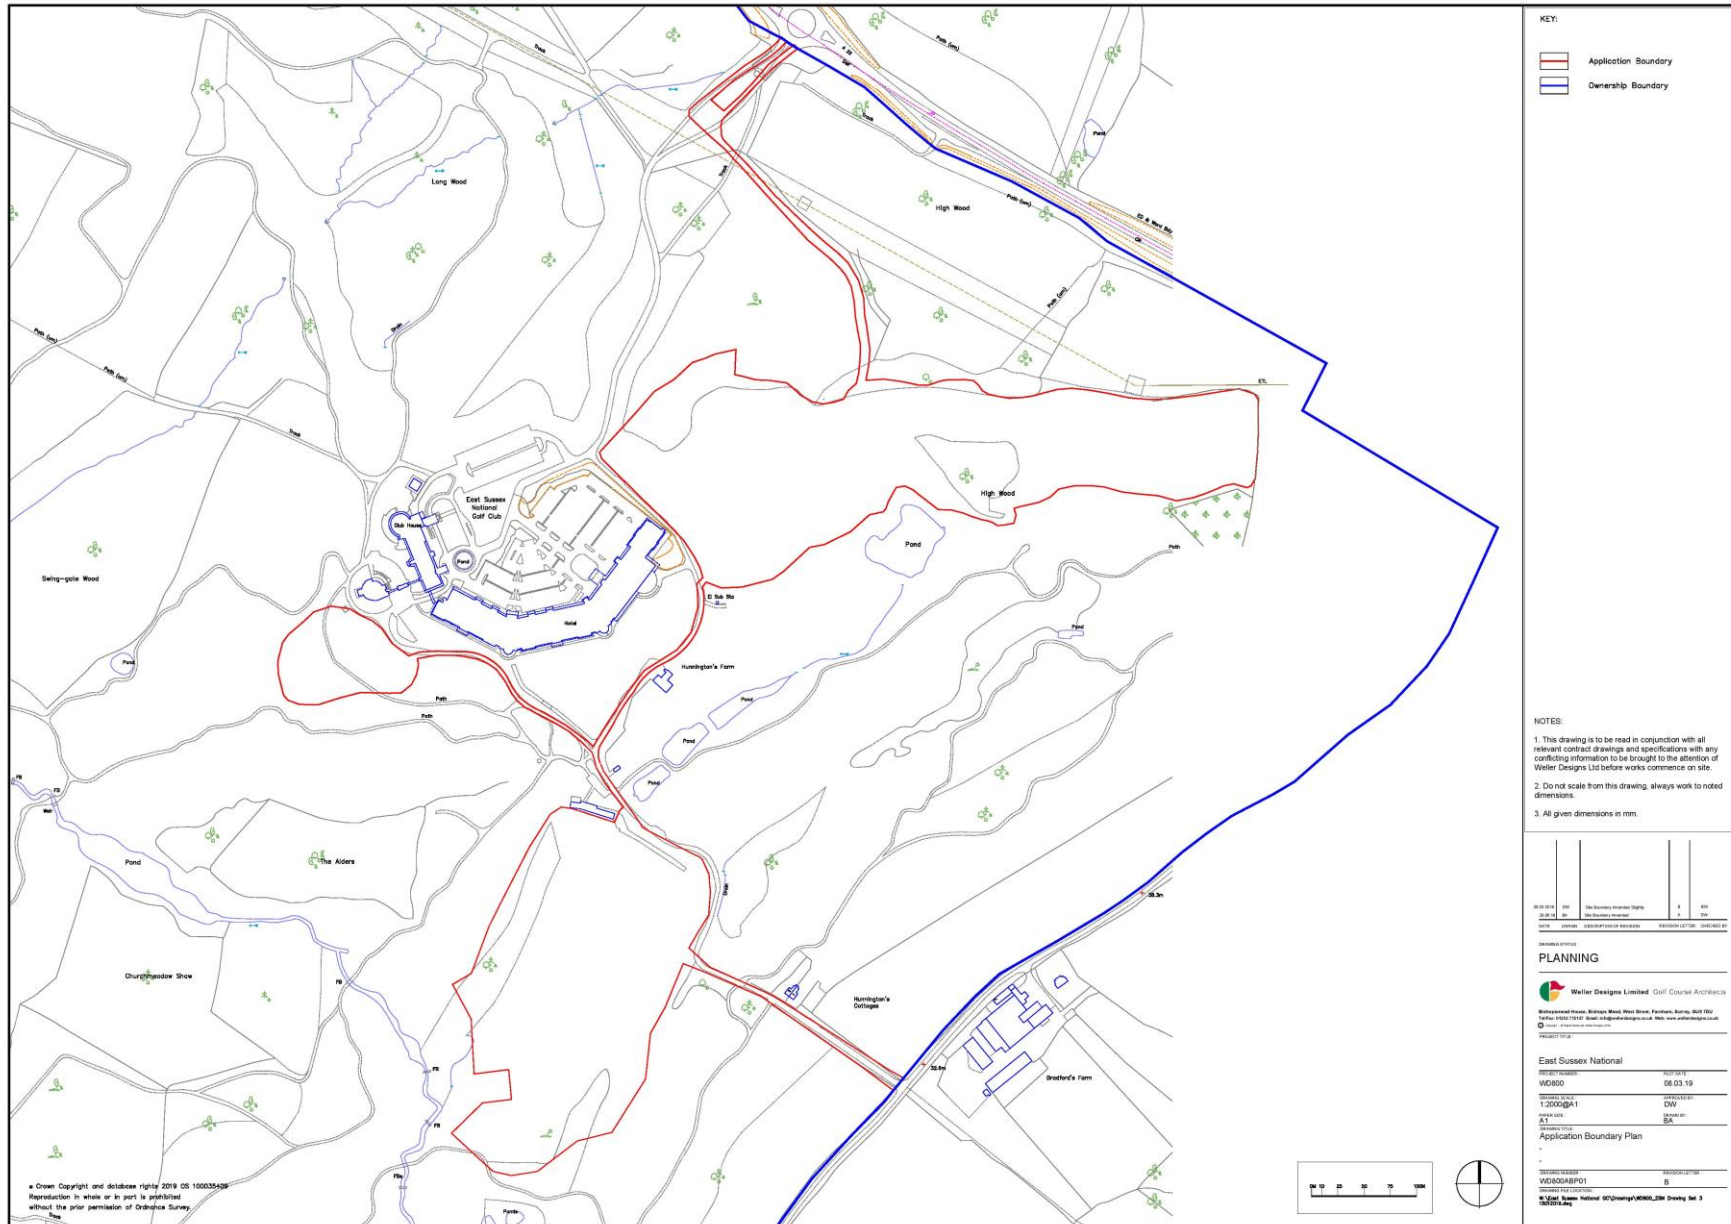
Application Boundary Plan (see also scaled plan WD800ABP01A)
